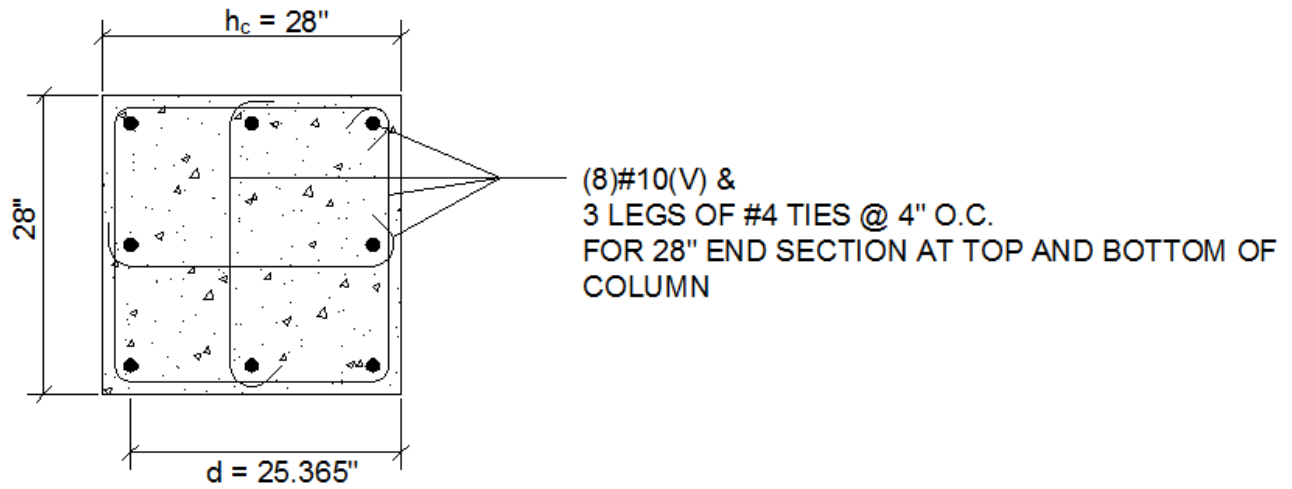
Exterior column, cross-section at end of column at ground floor level based on SDC D design.
